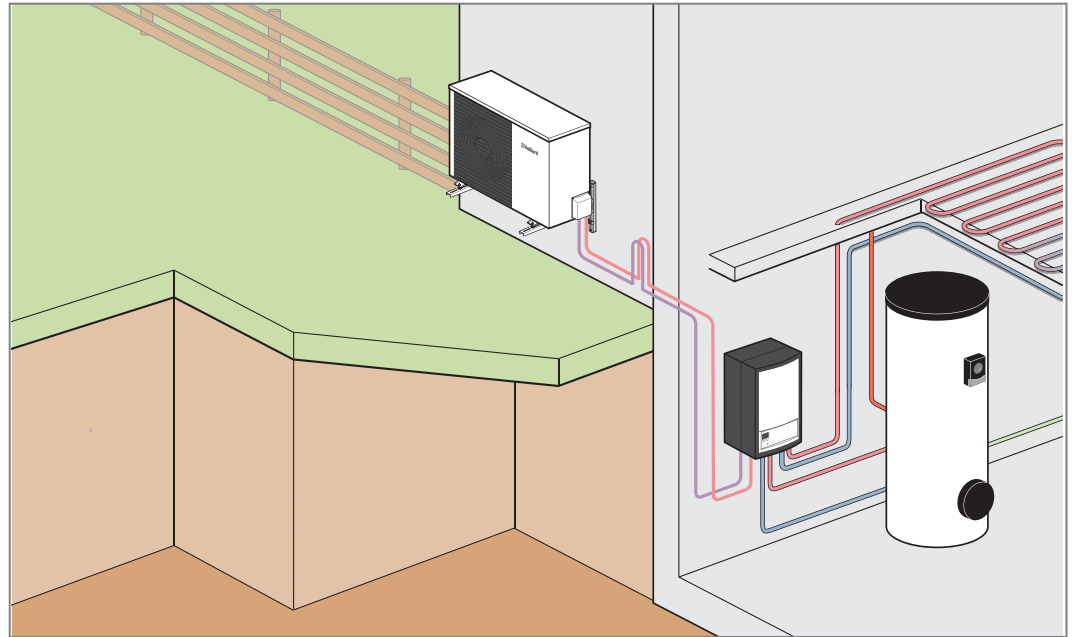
aroTHERM split with VWL ..7/5 IS hydraulic station - wall-mounting
